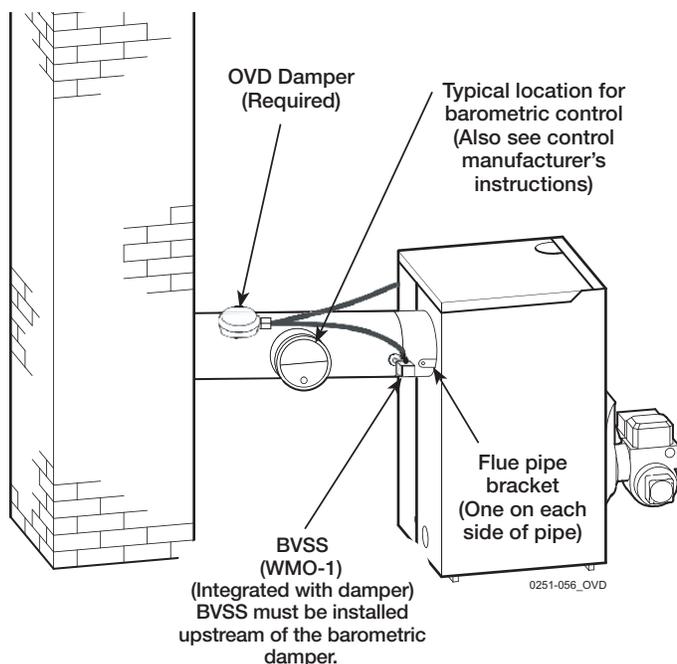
Back outlet breeching connection for OSB-3 through 6 with OVD Damper.
